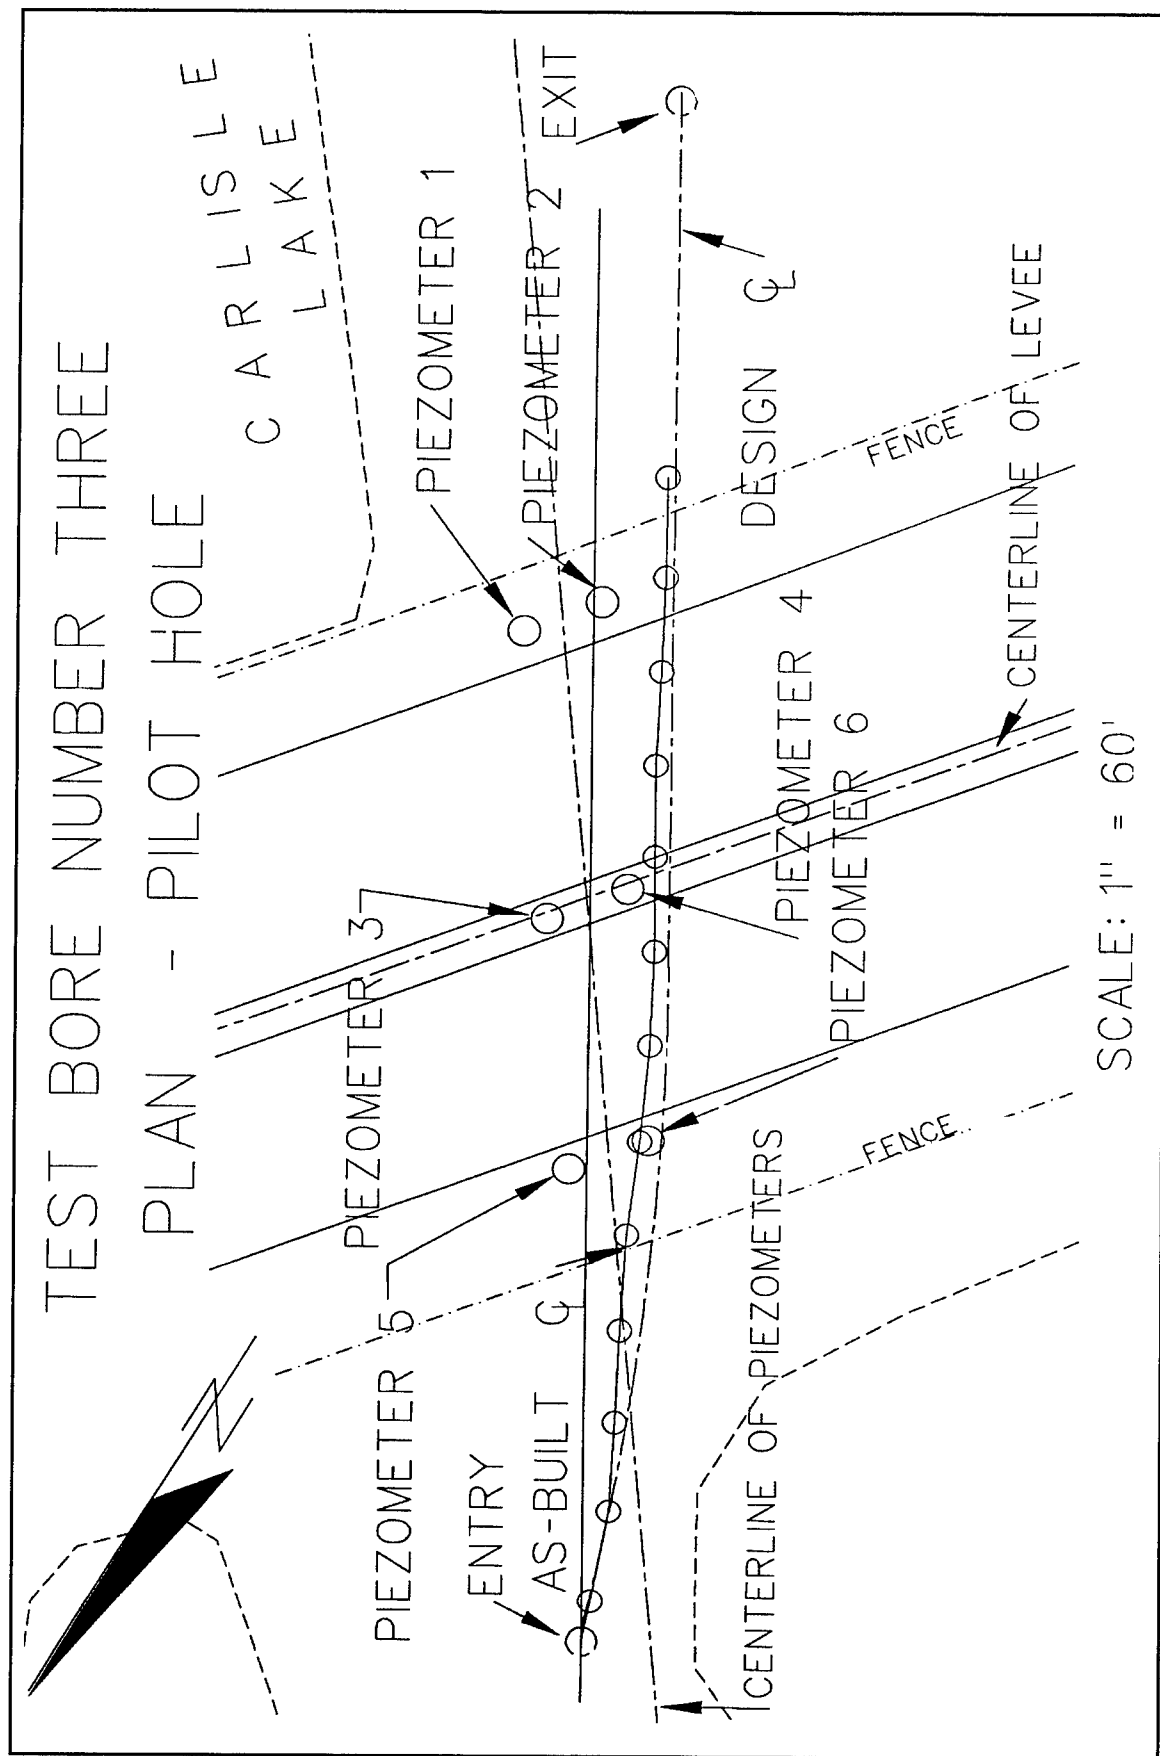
Plan view of Bore 3; planned and as-built location. (To convert feet to meters, multiply by 0.305; to convert inches to centimeters, multiply by 2.54)
